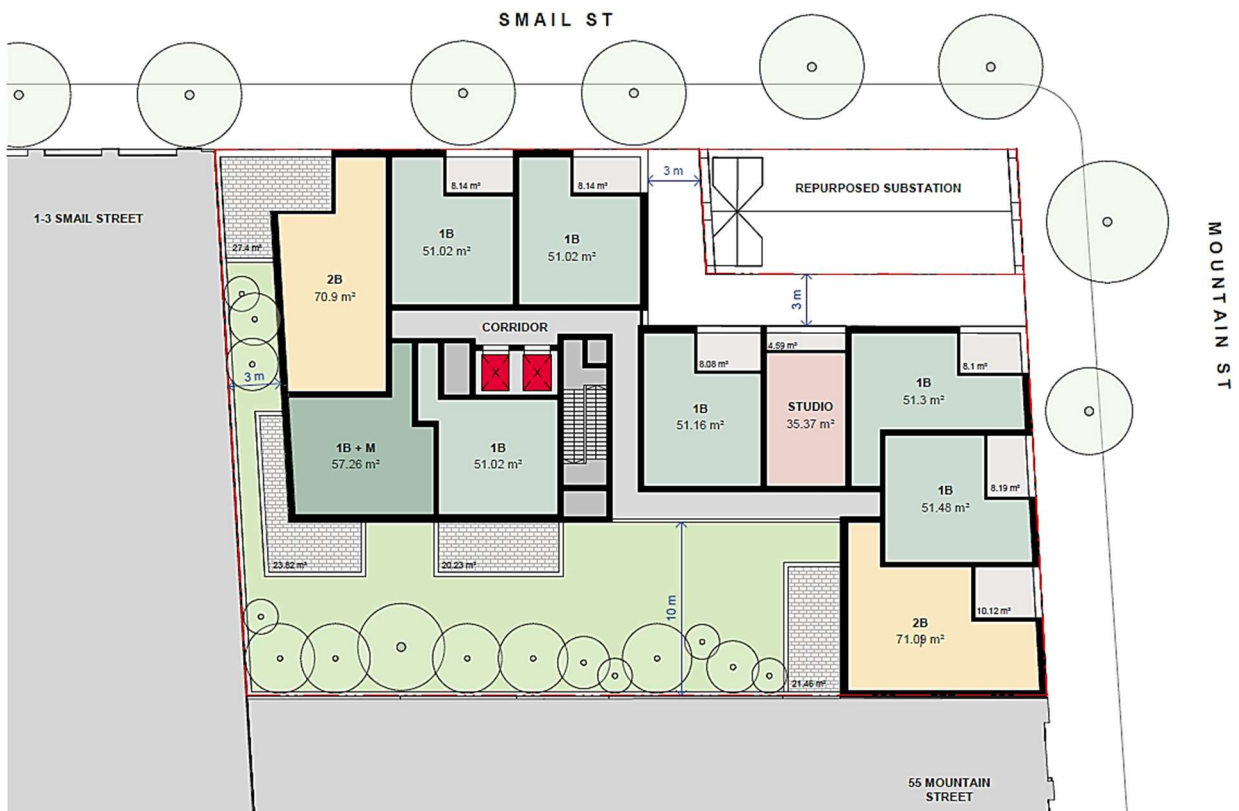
Proposed planning proposal First Floor Plan (PP03.01).
